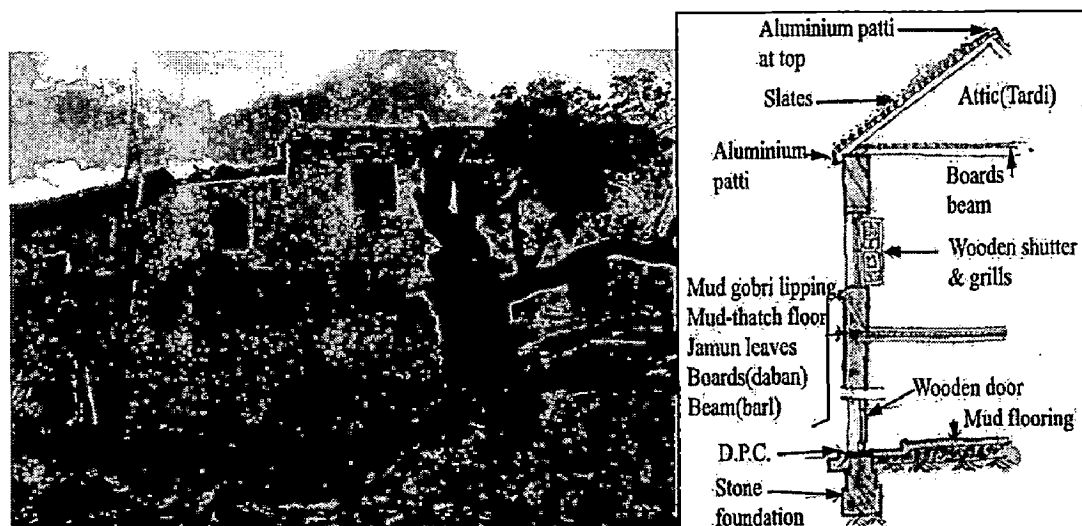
Mud houses in Lahaul and a typical section of mud wall
